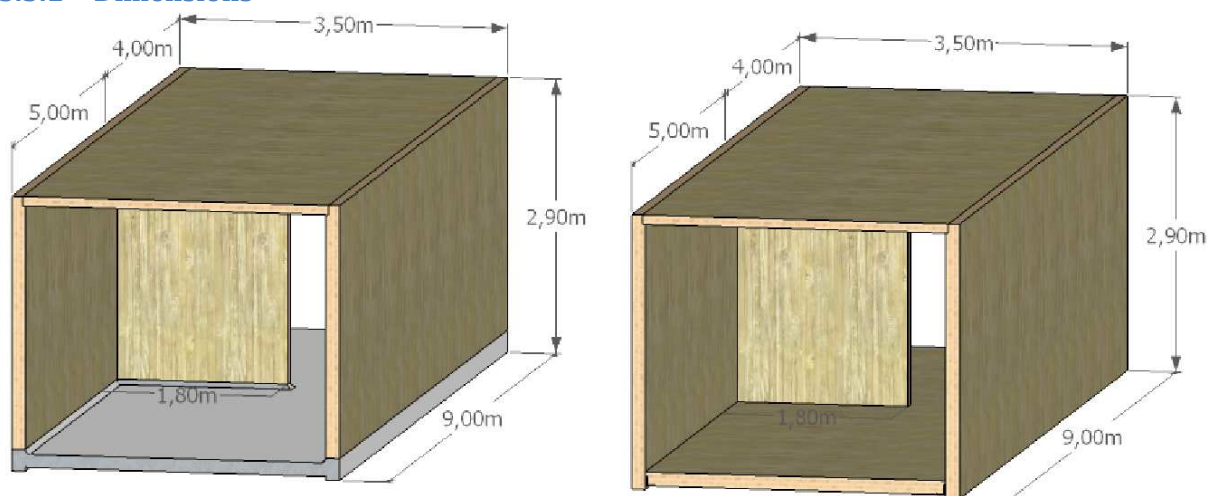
Representation and dimensions of module with concrete (left) and CLT (right) floor
